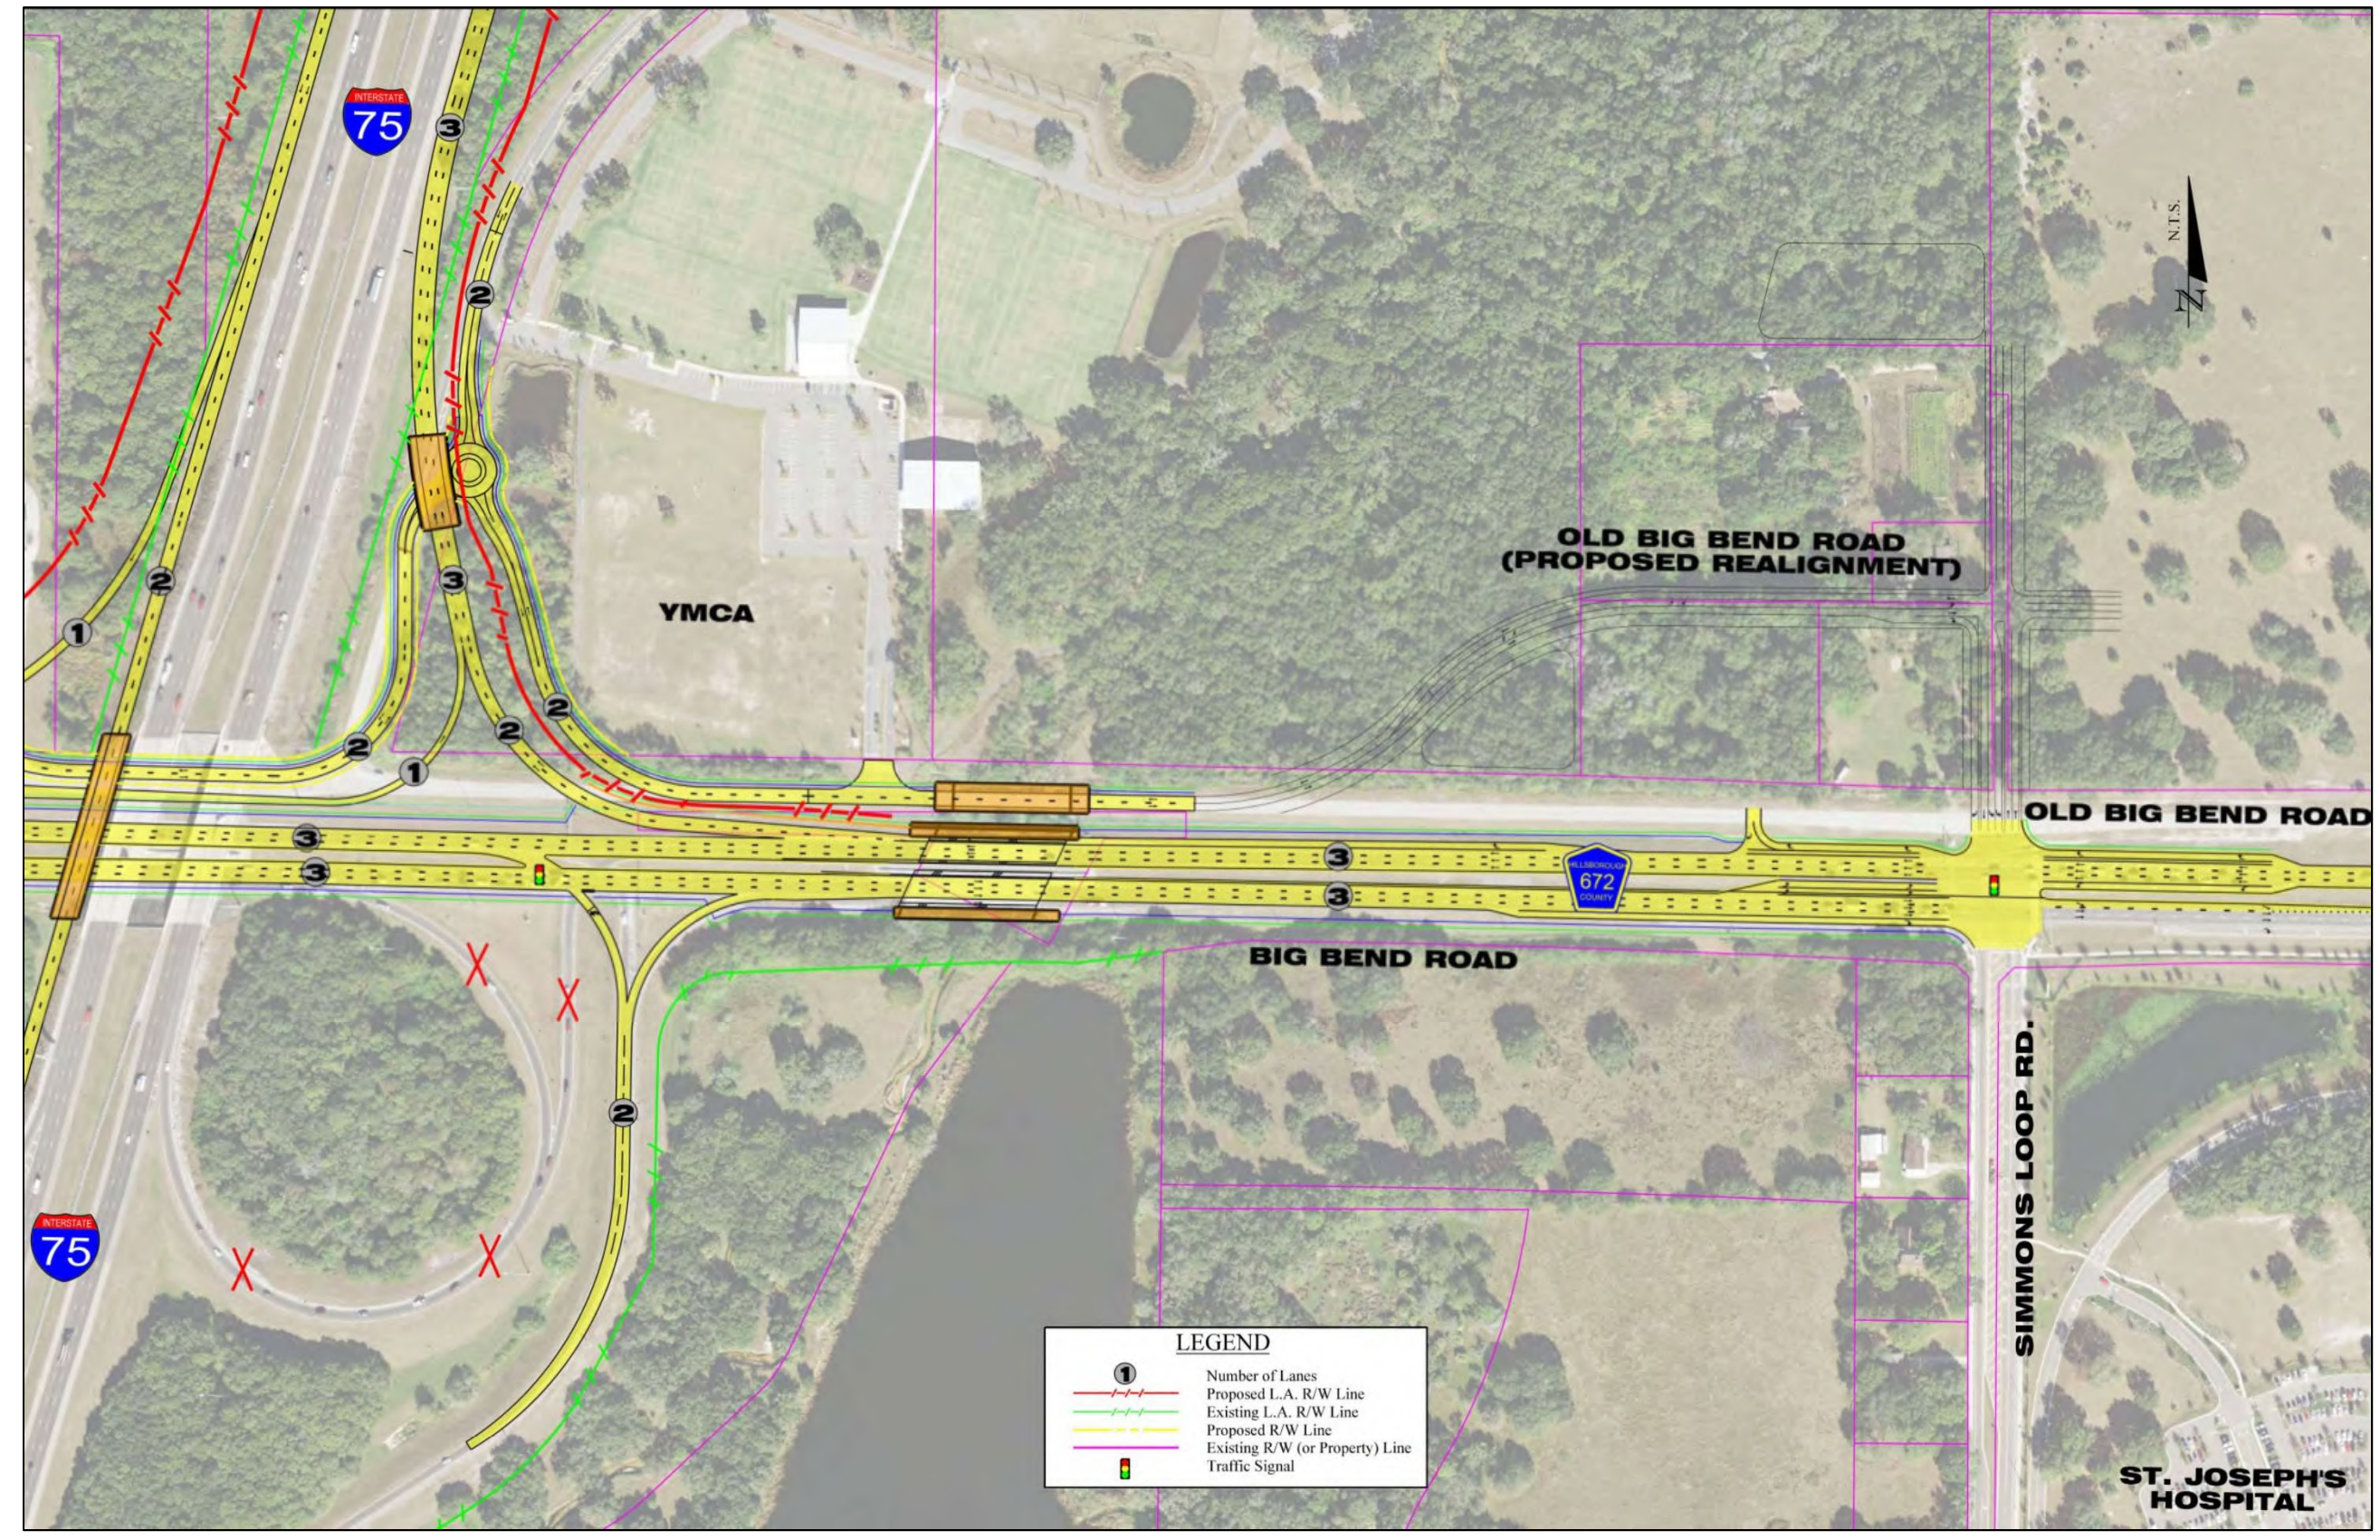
D – Proposed Lane Geometry and Traffic Control (Sheet 4 of 4: I-75, North of Big Bend Road – Detail)
